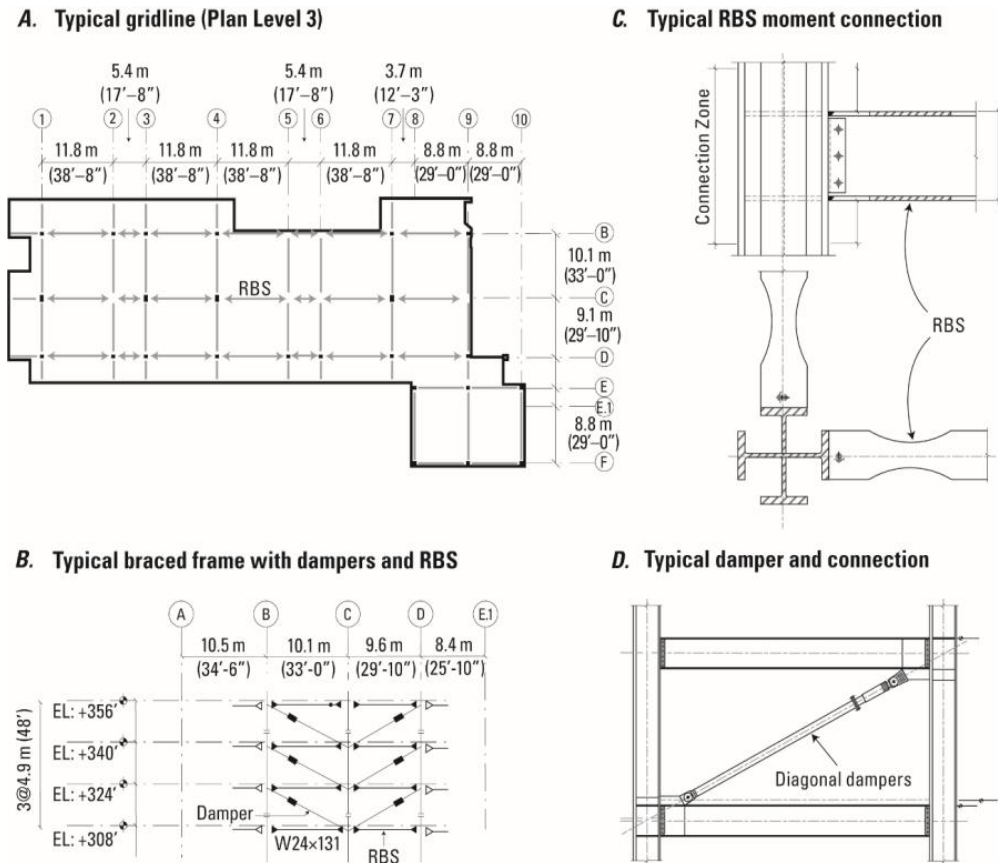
(a) Typical plan view depicting RBS, (b) typical vertical section depicting frames braced with dampers and RBS, (c) typical RBS moment connection, and (d) typical diagonal bracing damper and its connection.
